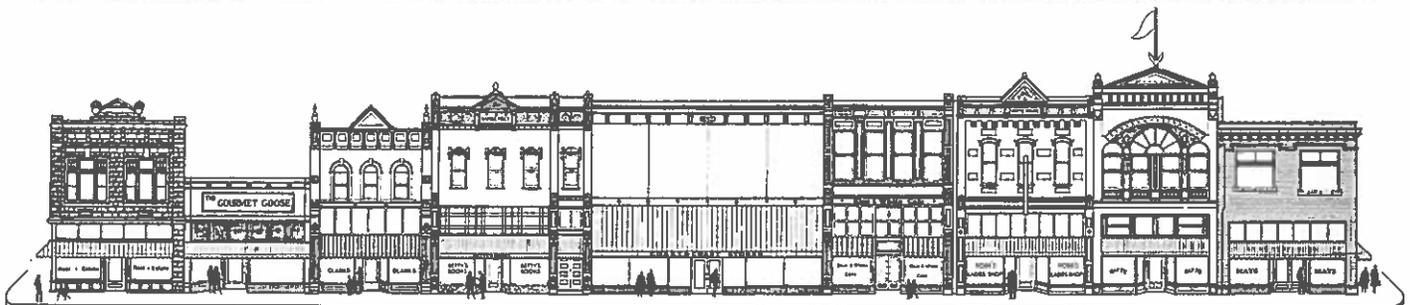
West Elevation 1800 Main Block - Existing and Proposed Condition
